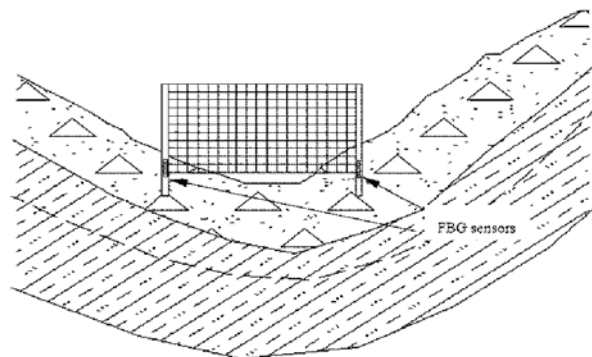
Schematic sketch of an FBG column-net arrangement in one cross-section for monitoring debris flow
